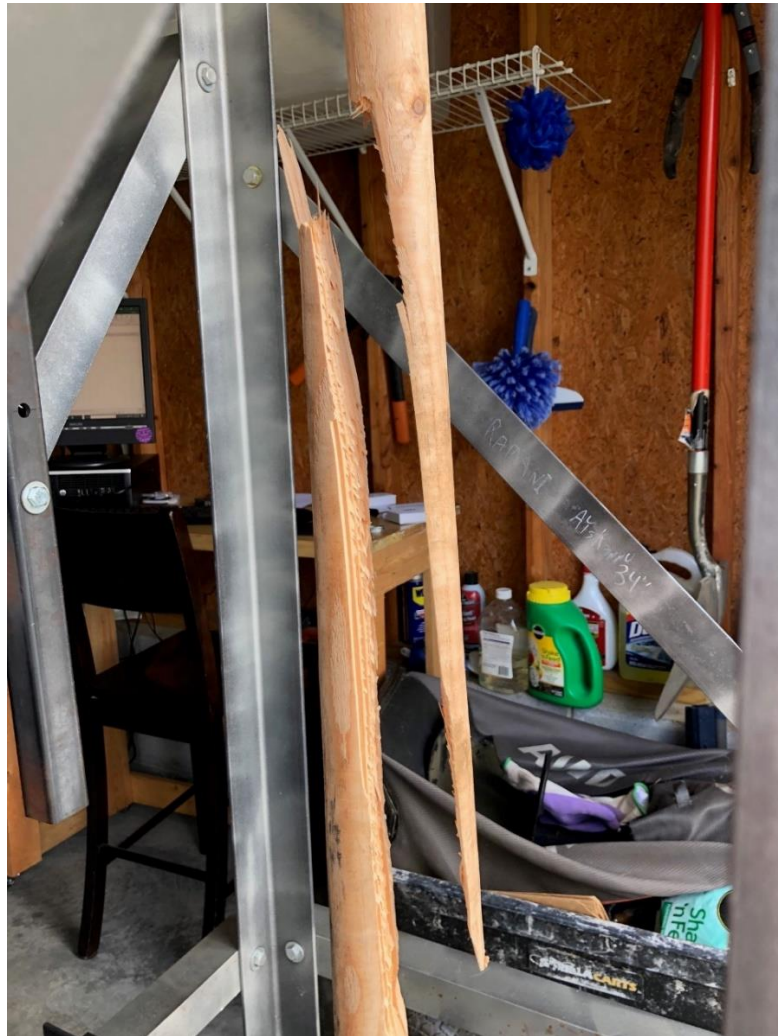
Test Pole Failure, Top and Bottom Sections
